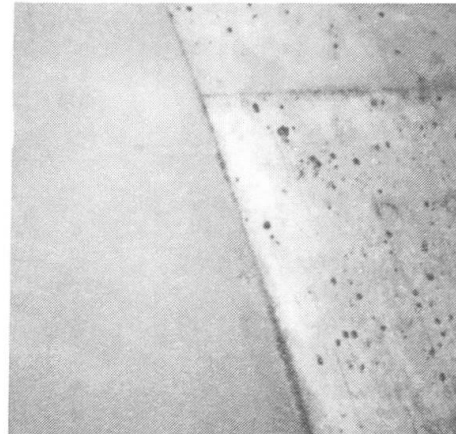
Slope concrete surface of a dome constructed by permeable form (left) and plywood form (right)
